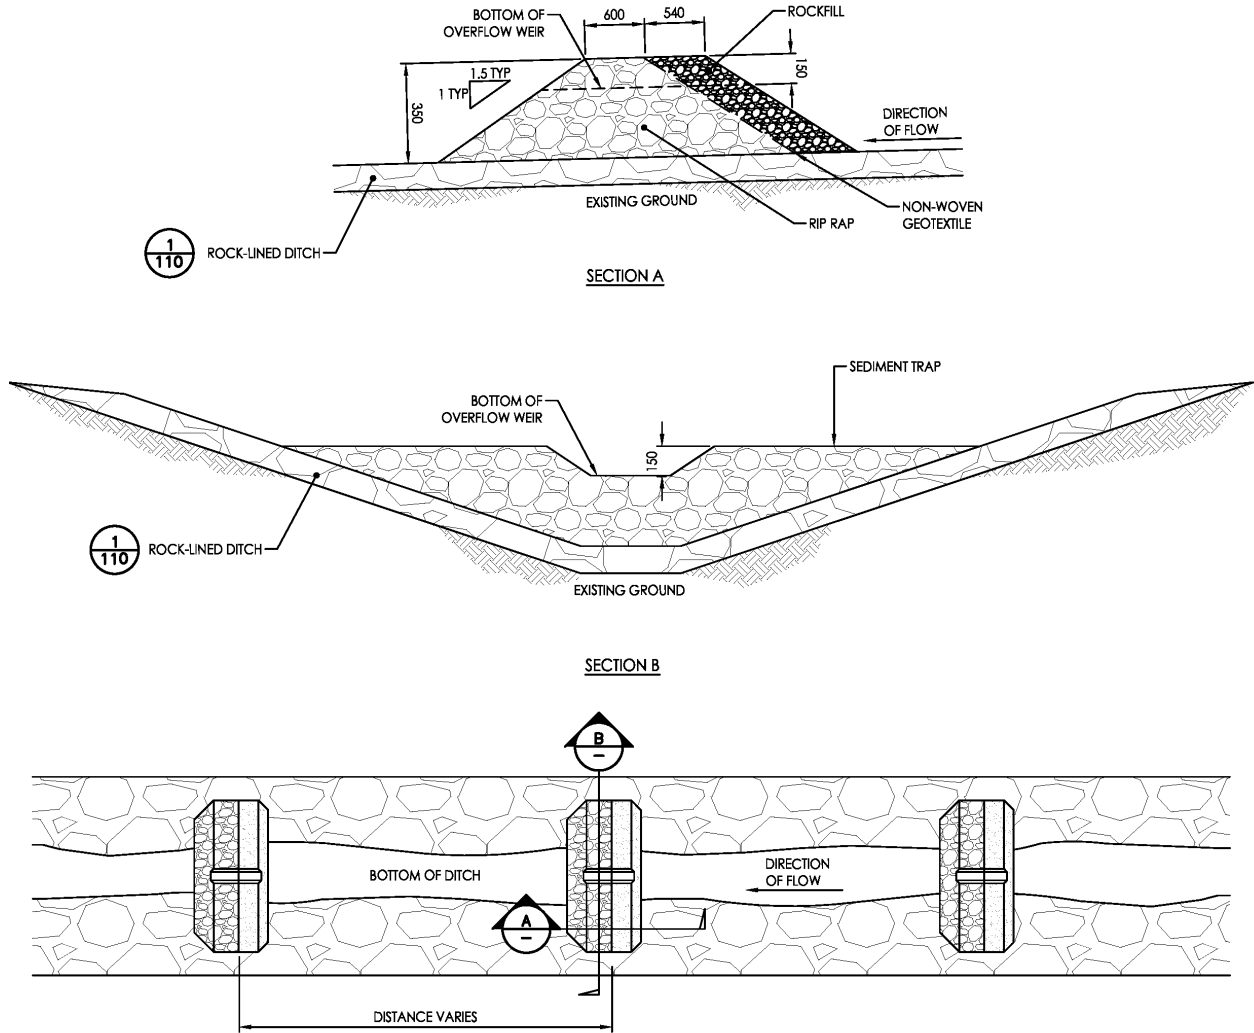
Sediment Trap Overflow Weir Typical Detail
